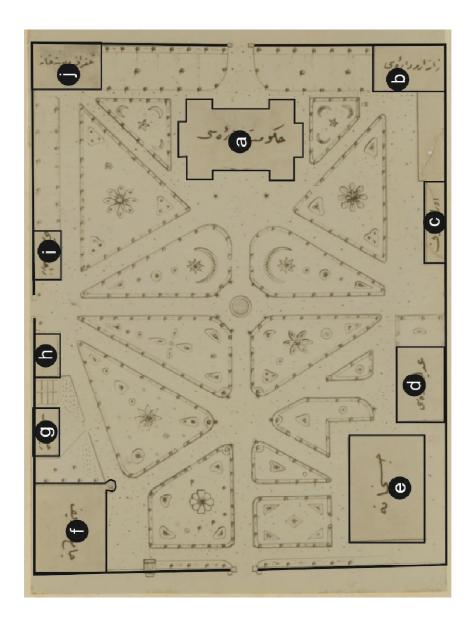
Dedeağaç, civic center, c.1890s, site plan drawing.
